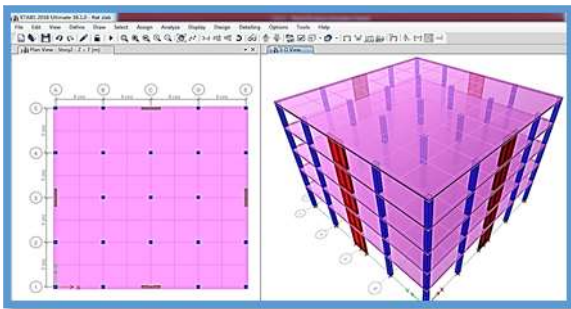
Flat slab with shear wall at exterior edges (model 3)
